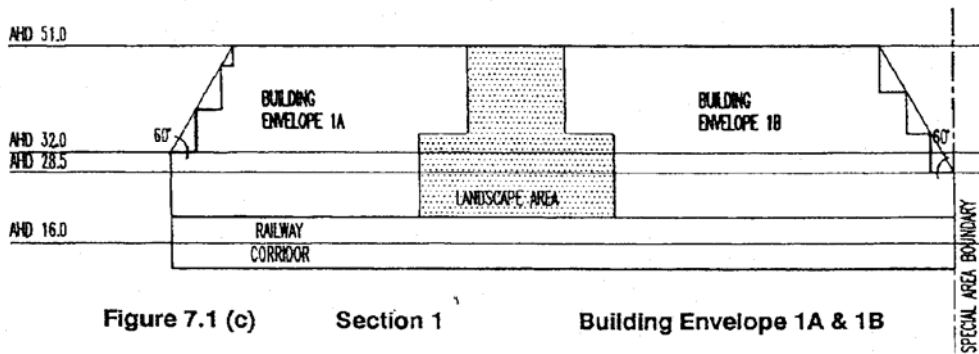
(c) Section 1 Building Envelope 1A & 1B
